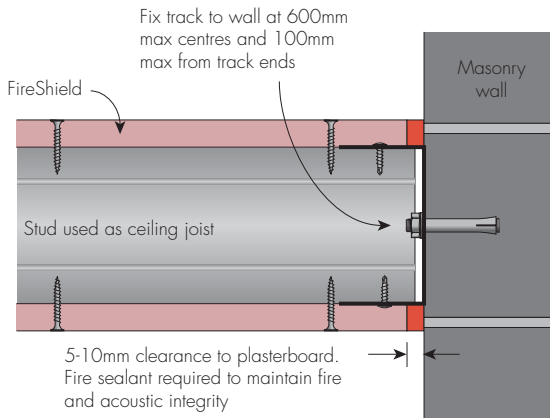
Non-Trafficable Ceiling to Masonry Wall
